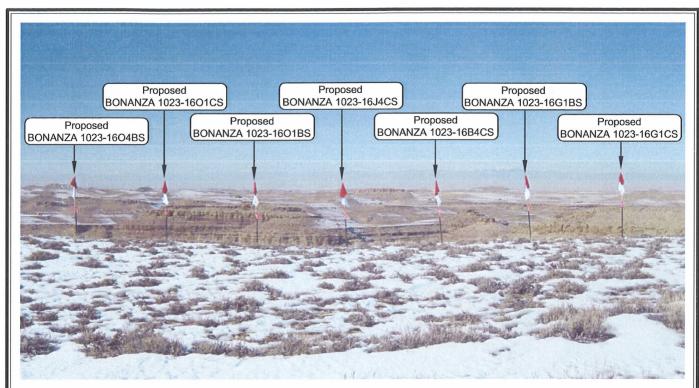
PHOTO VIEW: FROM LOCATION STAKE TO CORNER 12
